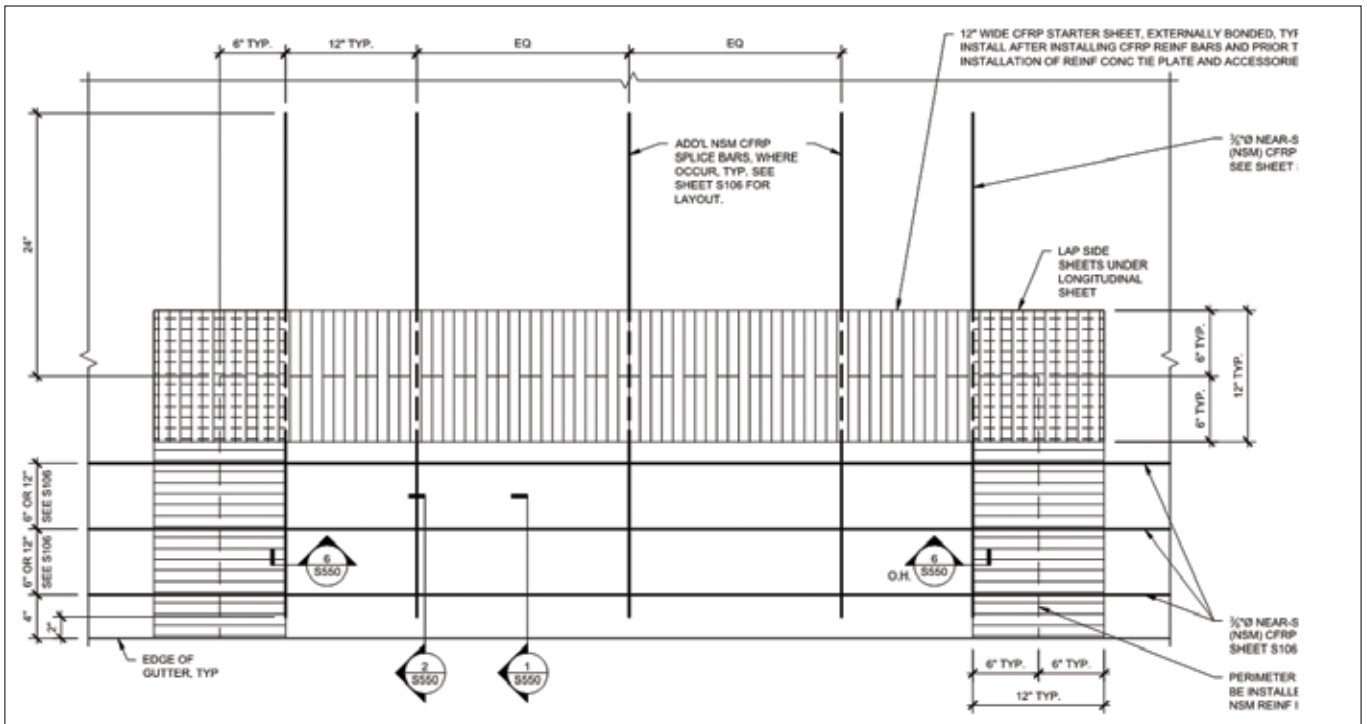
Tie plate, NSM, CFRP, FRP and externally bonded starter sheet detail
